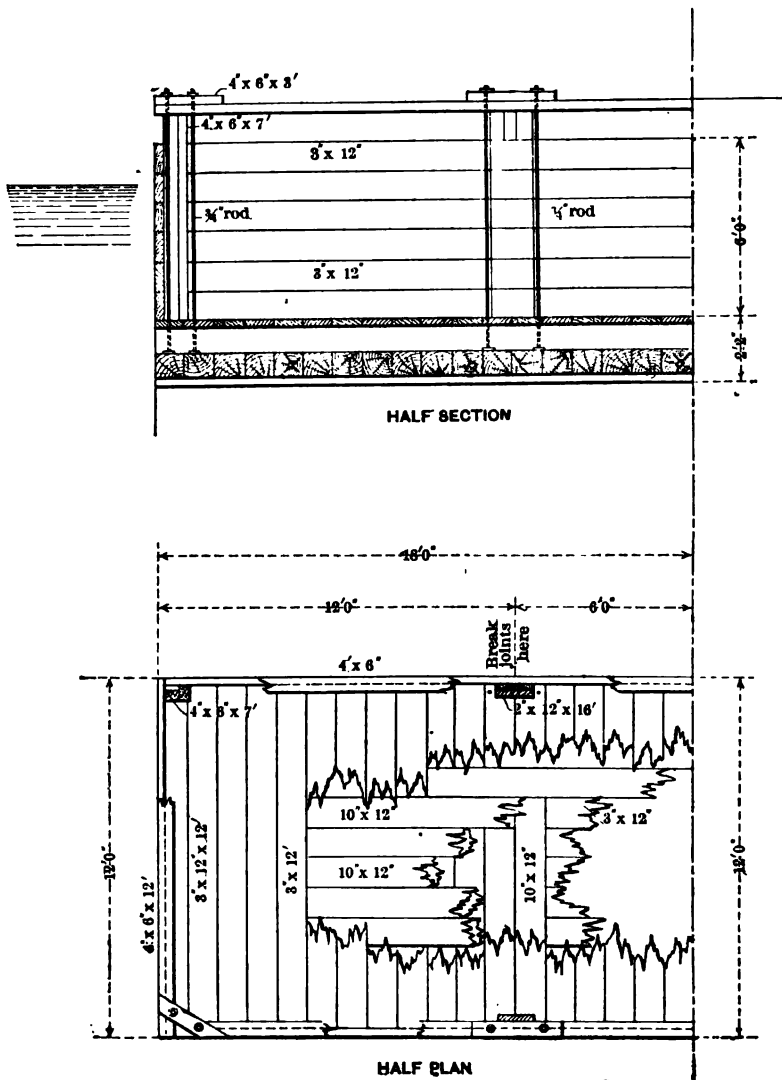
COFFER-DAM ON GRILLAGE, PAYETTE AND WEISER RIVER BRIDGES, UNION PACIFIC SYSTEM.
